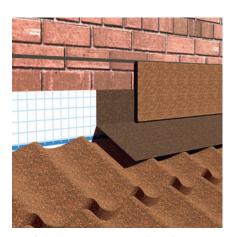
The adjoining of roof pitch to the wall sideways on the slope
